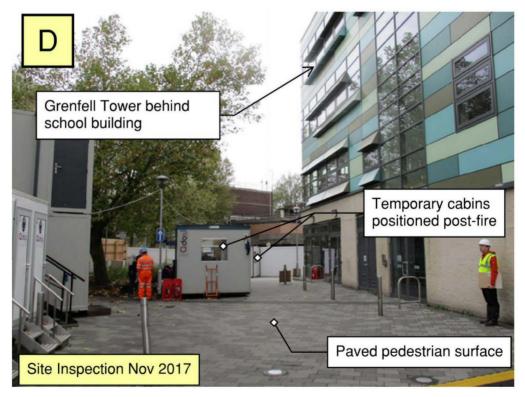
Image of secondary vehicle access route from Silchester Road (facing south towards Grenfell Tower, which is located behind the school building on the right side) – Location 'D' Figure 17.38.
